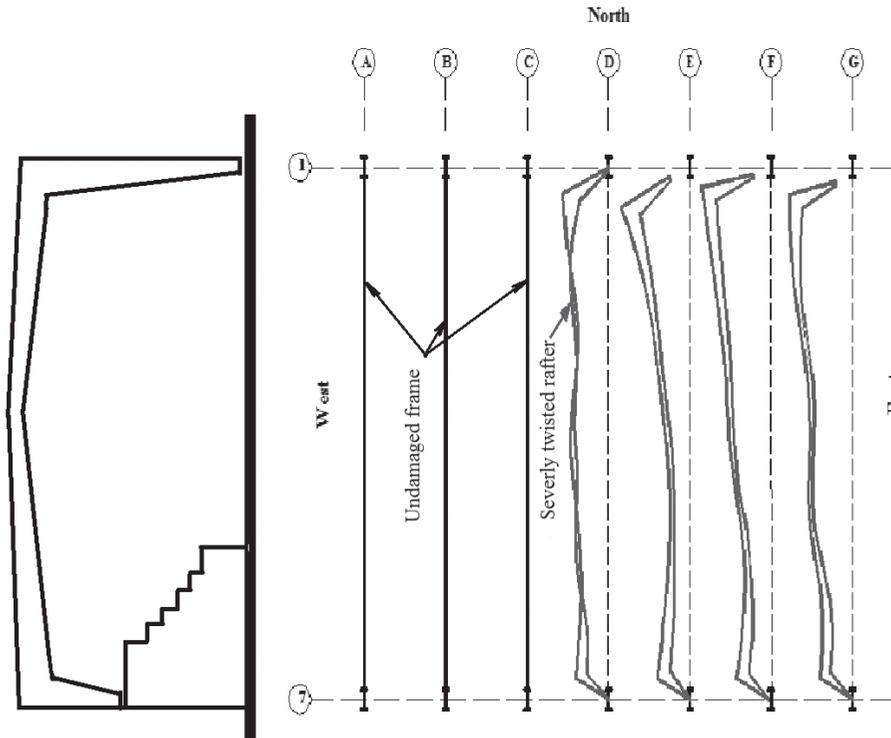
Schematic layout of collapsed frames D, E, F, and G.
